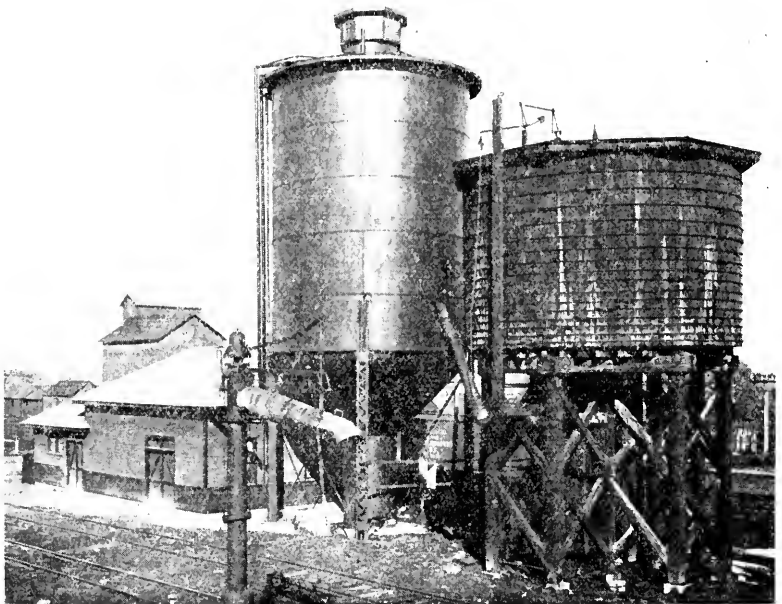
WATER COLUMN, ILLINOIS CENTRAL RAILROAD, PARKERSBURG, IOWA
